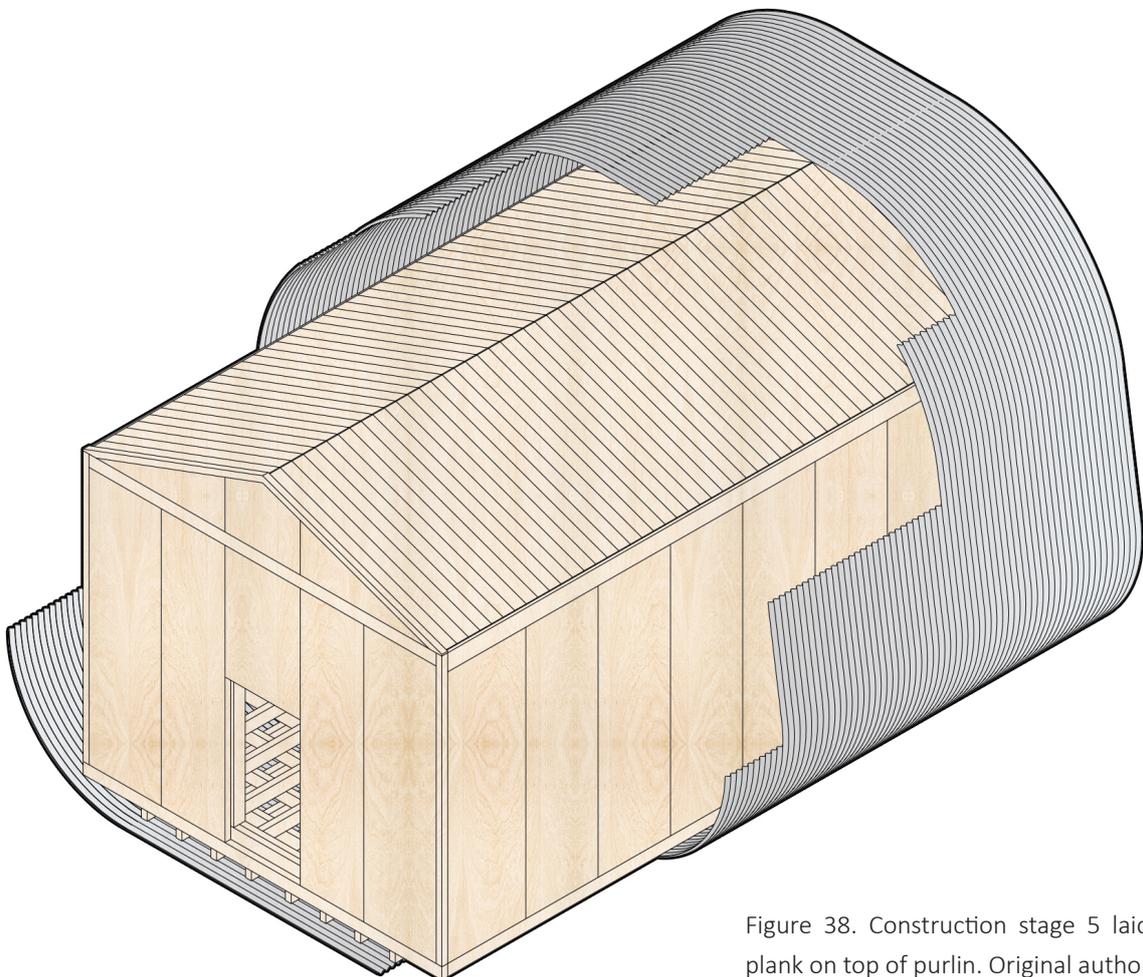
Construction stage 5 laid plank on top of purlin. Original author
